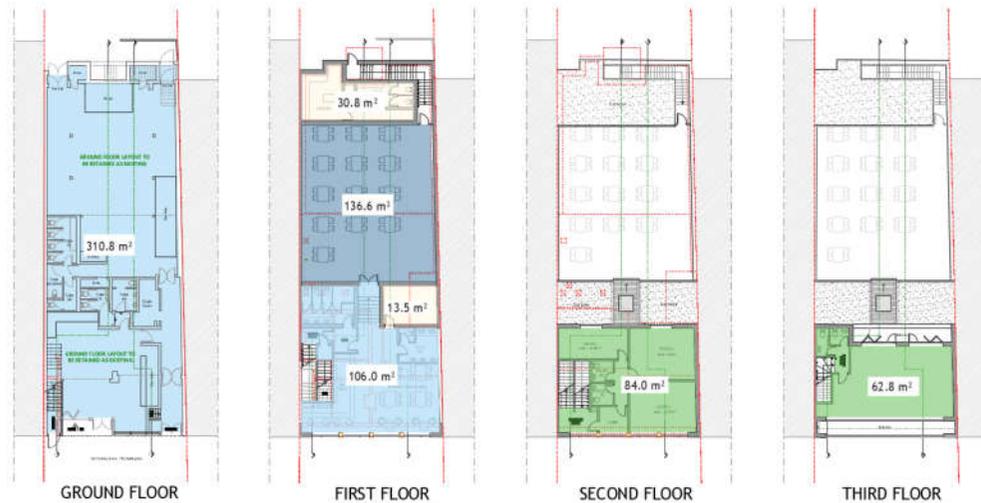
Floor areas divided for leisure use at lower levels and offices located at the 2 upper levels
